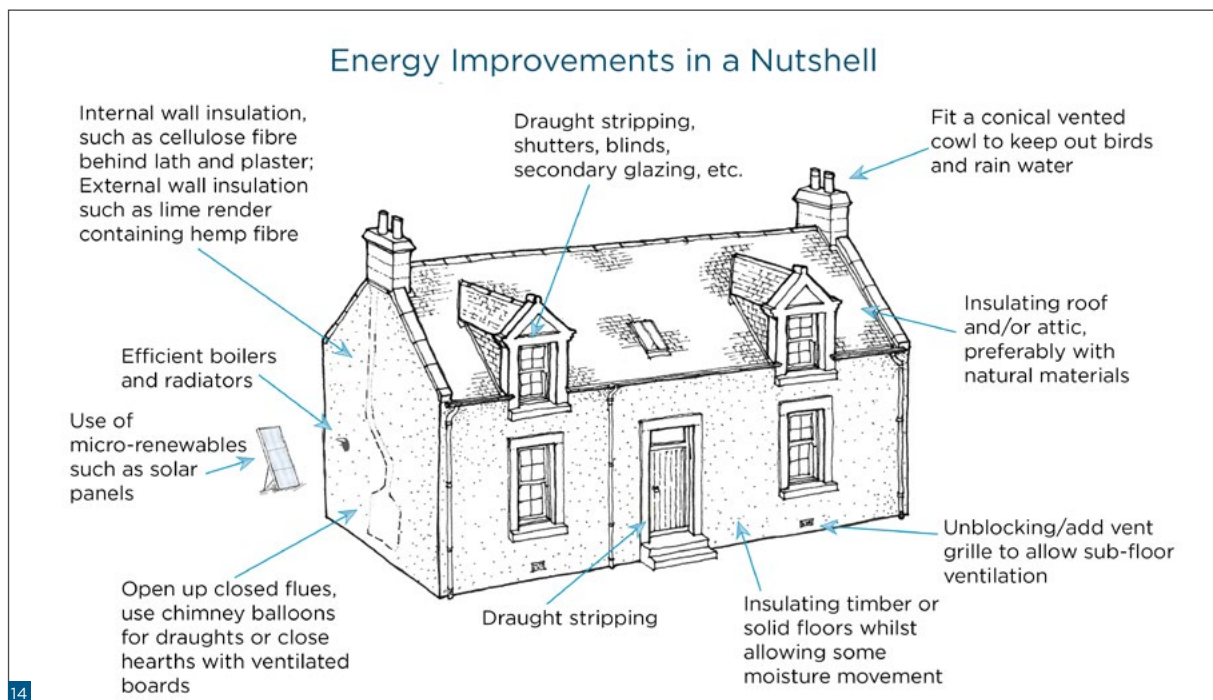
Summary drawing of fabric upgrade measures for a traditional building. Image © John Gilbert and HES
